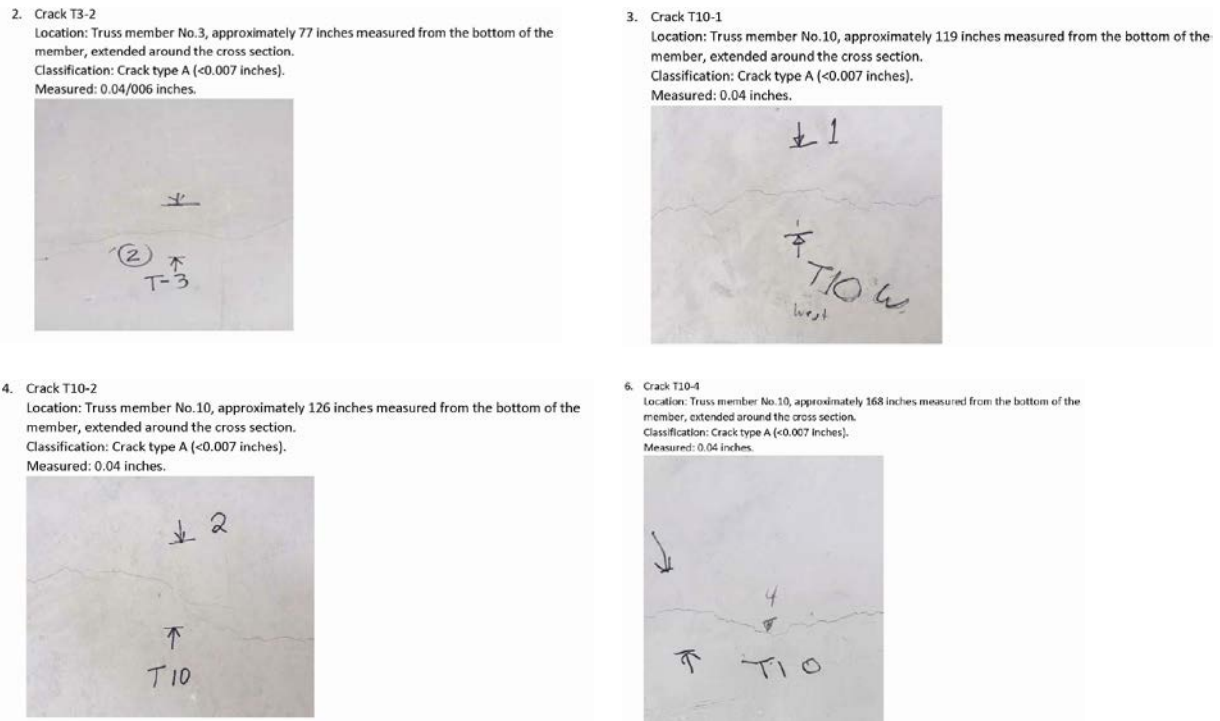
Cracks in Truss Members 3 and 10 on February 6, 2018, after application of PT in Members 2 and 11.¹¹⁴
